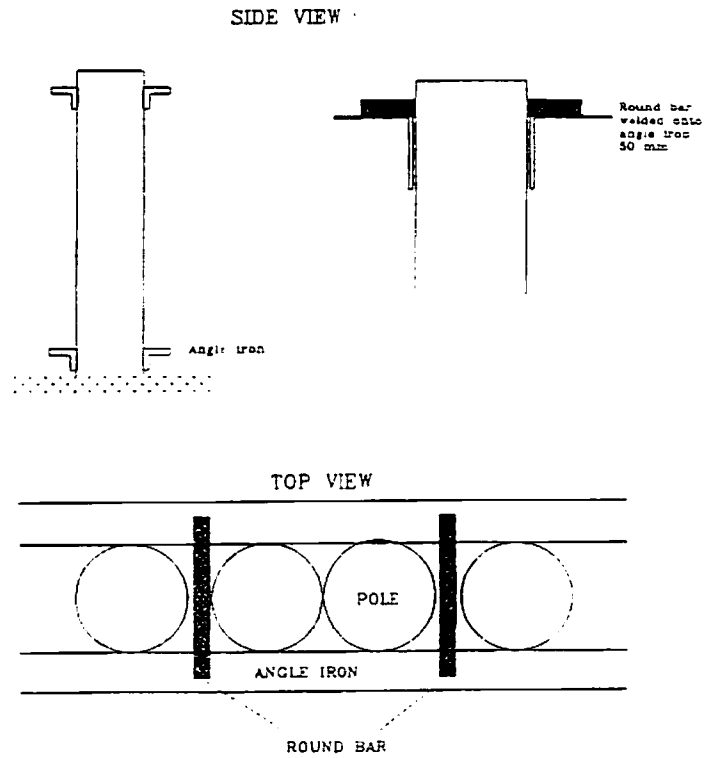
b. Wall construction using angle iron with round bar supports.
